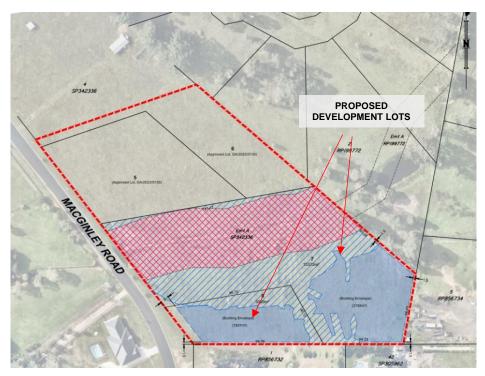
PROPOSED DEVELOPMENT LAYOUT
